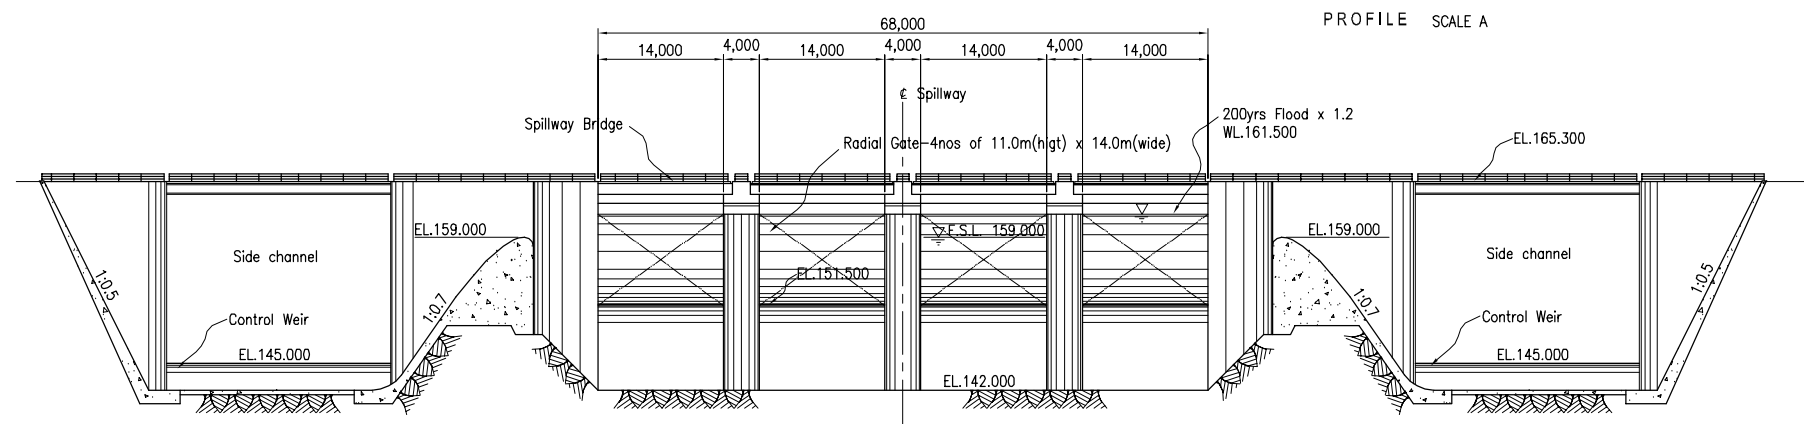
Typical Cross Sections of Proposed Agos Dam
